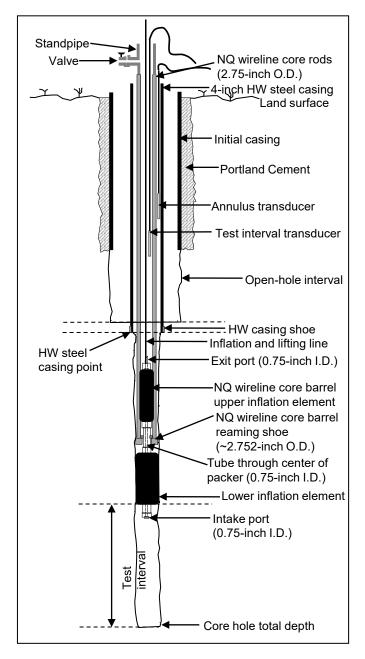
Formation (off-bottom) packer assembly deployed in the core hole.
